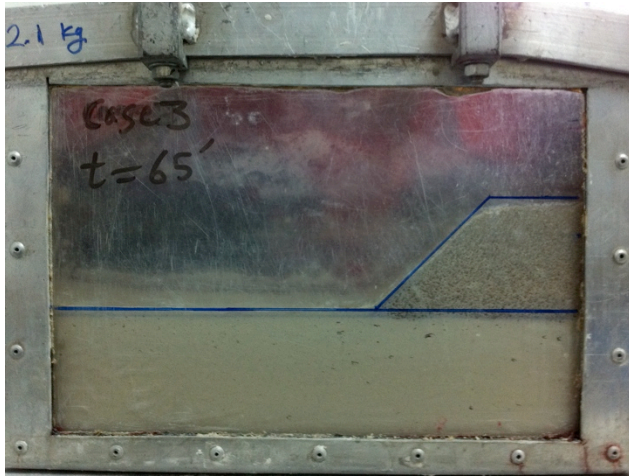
Deformation behavior of model III (unreinforced embankment on soft foundation)
